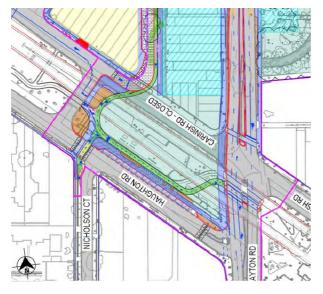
CARINISH ROAD REFERENCE DESIGN LAYOUT
